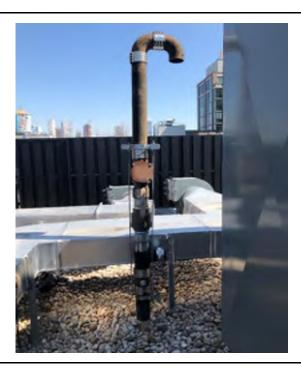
V1 riser in good condition, facing east. 8 April 2021.
